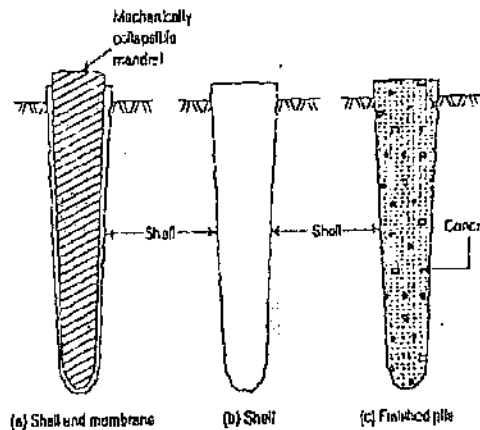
STAGES IN RAYMOND STANDARD PILE CONSTRUCTION
